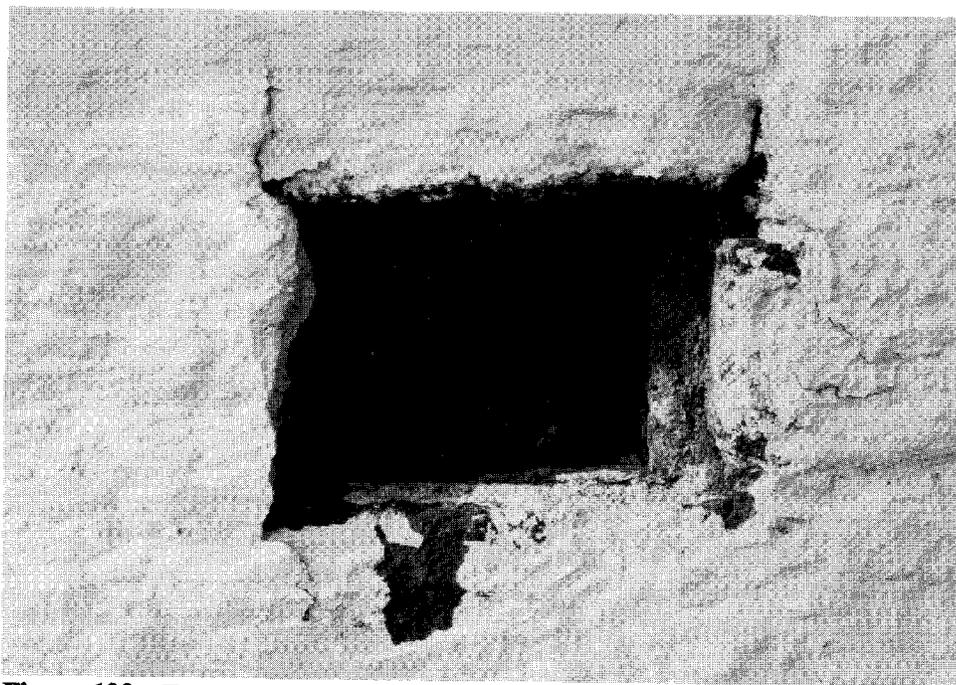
Tower, spalled brick face under west window of south elevation.
